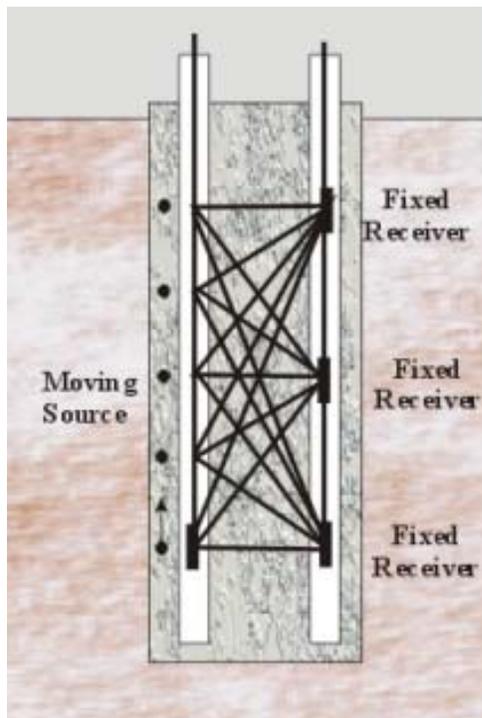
Crosshole Tomography (CT) test schematic for concrete foundation quality assurance
